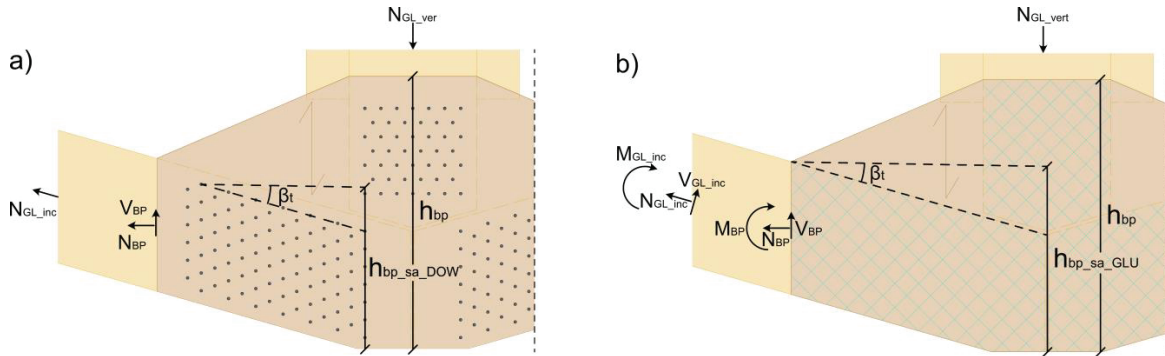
Verification of the central plywood plate: a) doweled trusses and b) adhesively bonded trusses.
